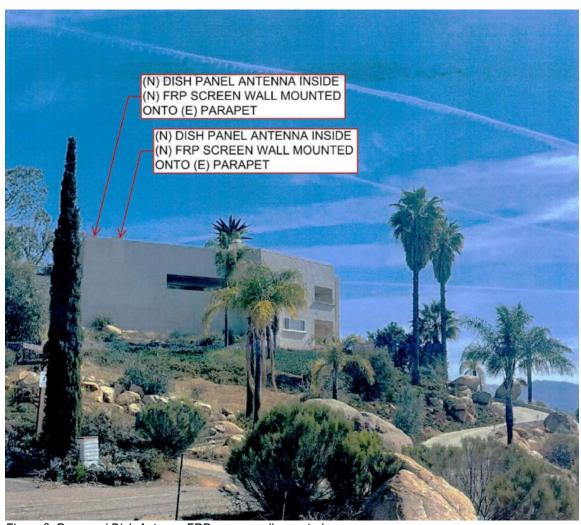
Proposed Dish Antenna FRP screen wall mounted.
